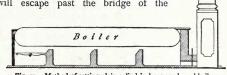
Method of setting plain cylindrical or egg-shaped boilers.
